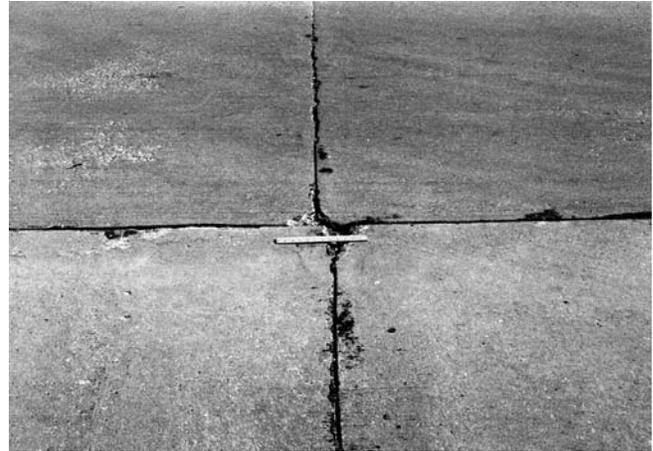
Low-Severity Spalling, Corner
